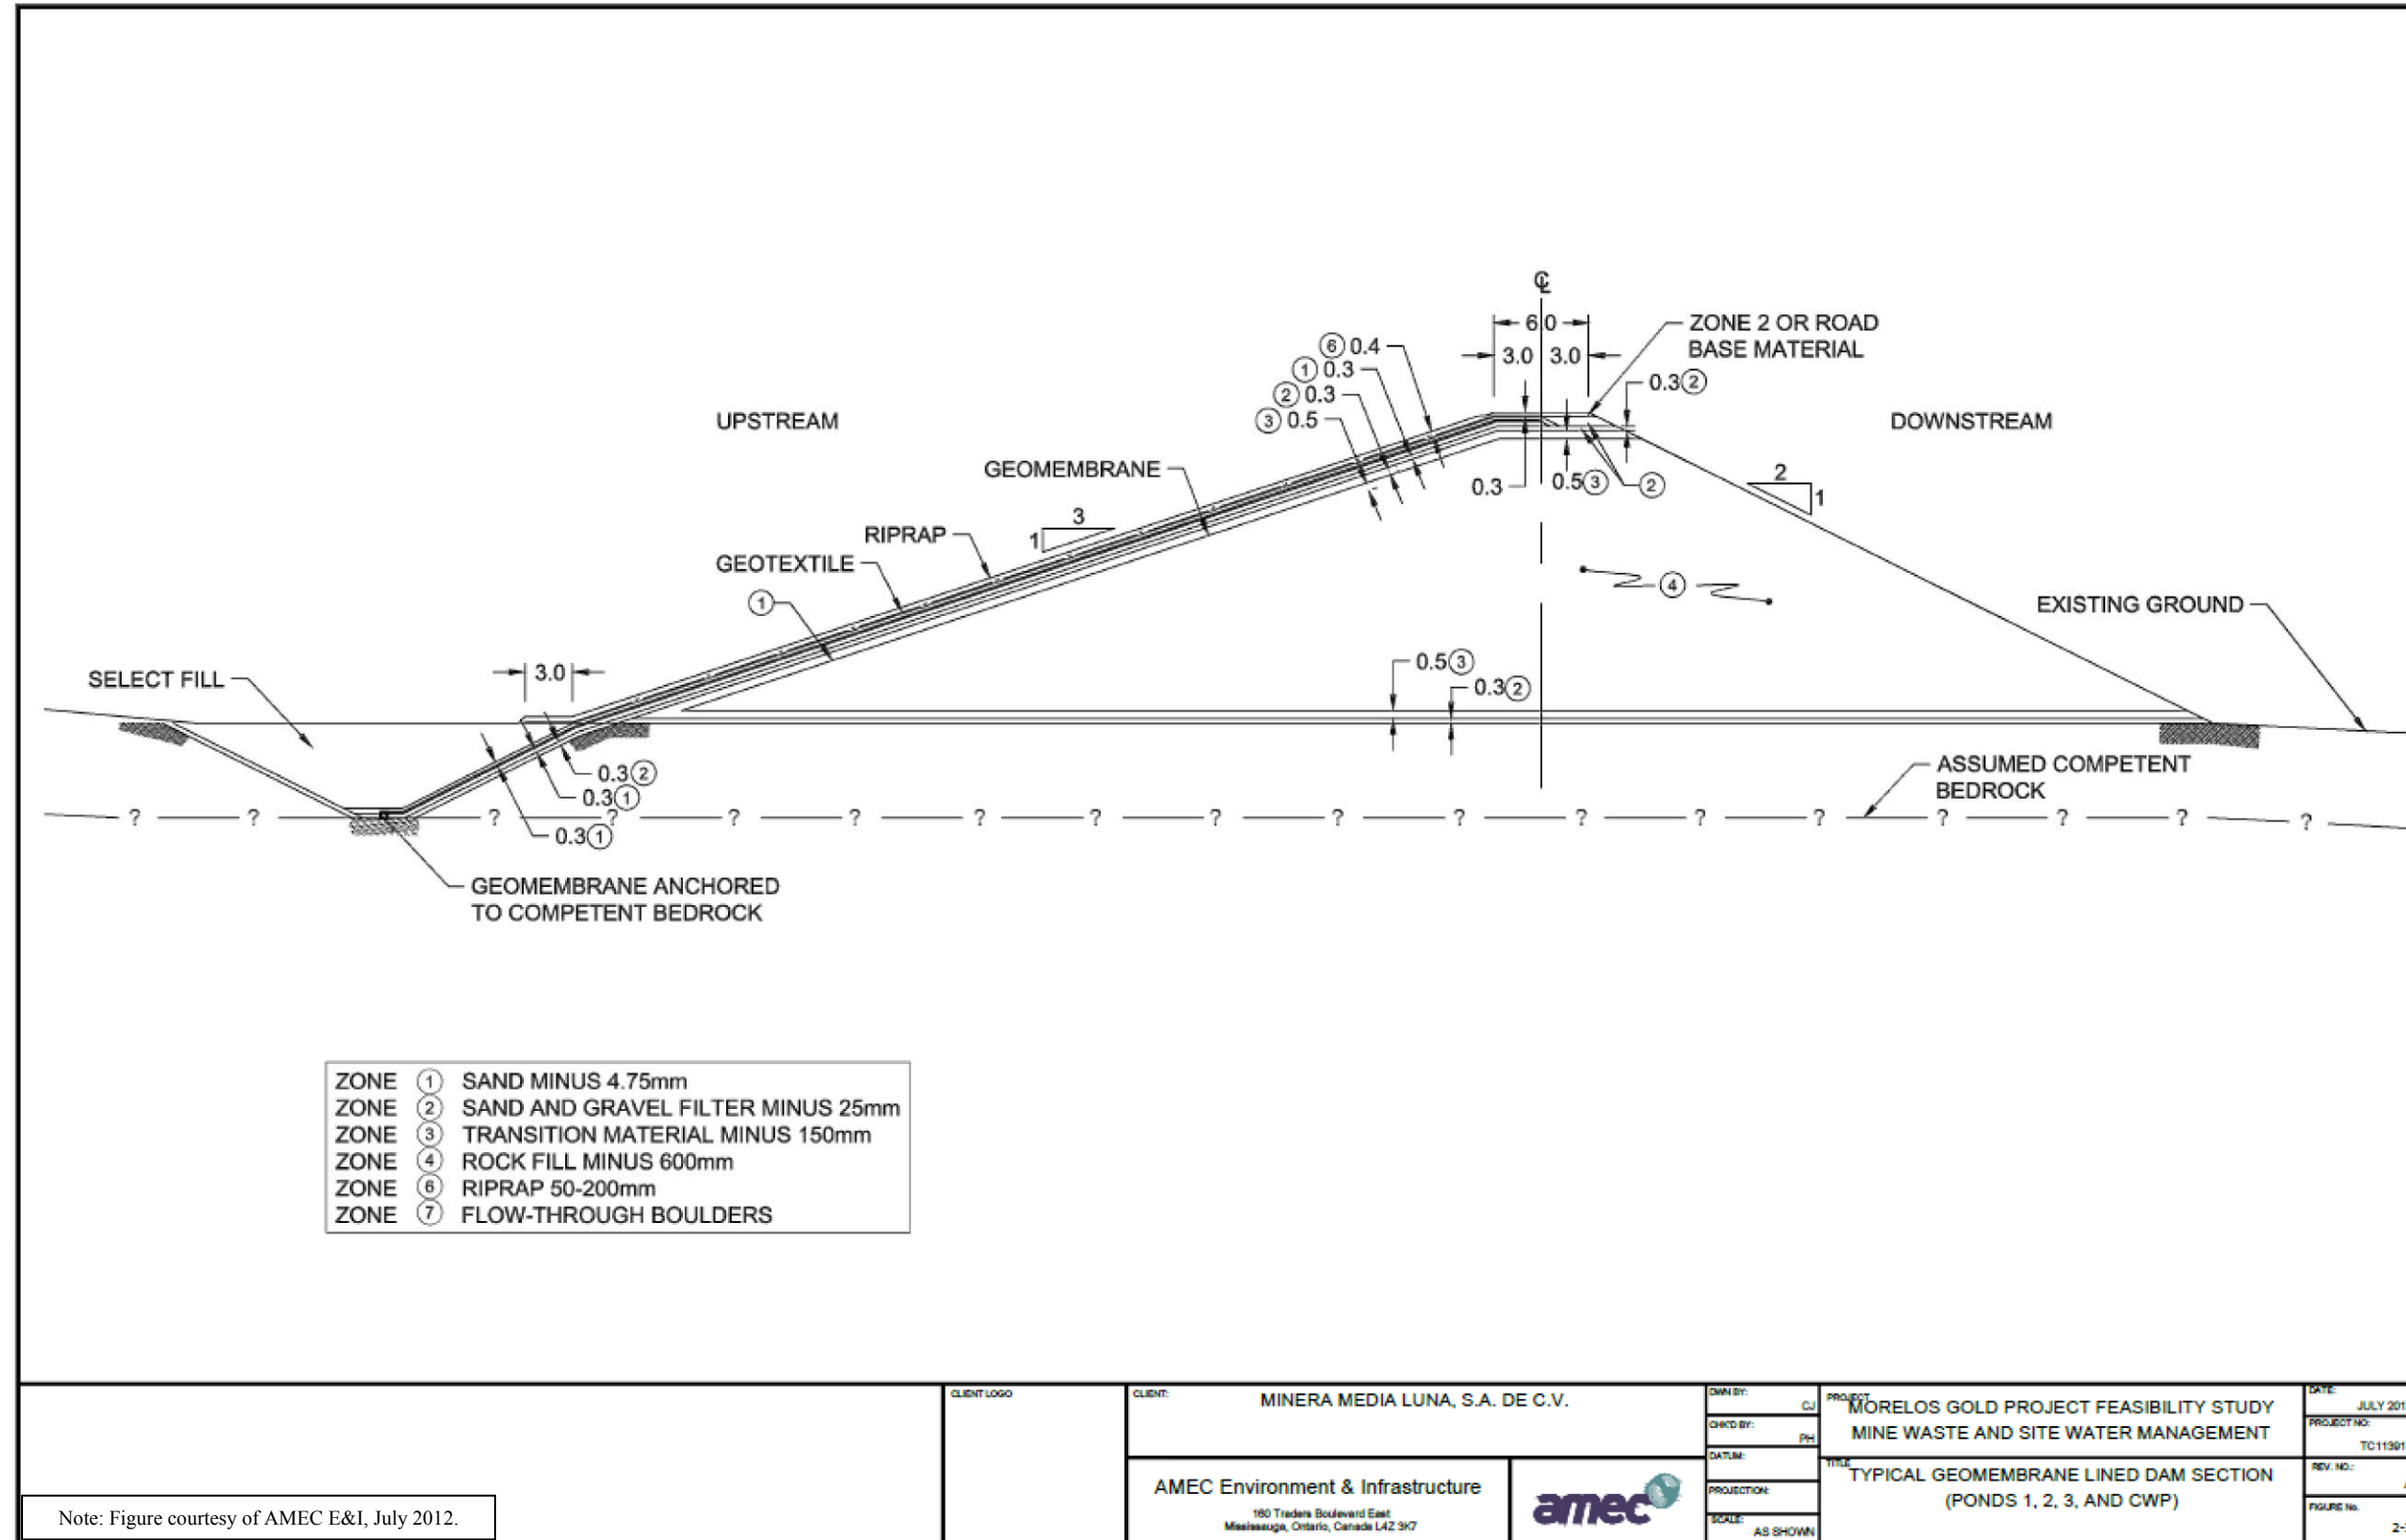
Typical Geomembrane Lined Dam Section (Ponds 1, 2, 3 and CWP)
